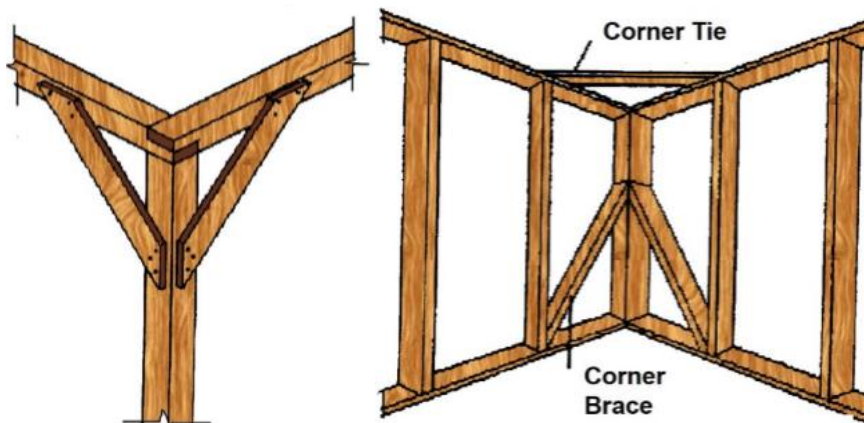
BRACING SYSTEM OF TIMBER WALL FRAME
